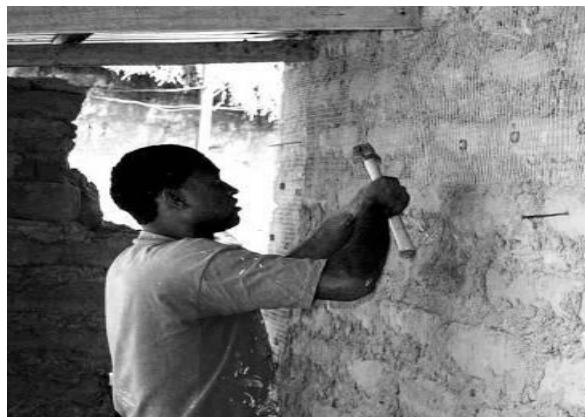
Placing the mesh on the wall (source: M. Blondet et al 2003, EERI)
